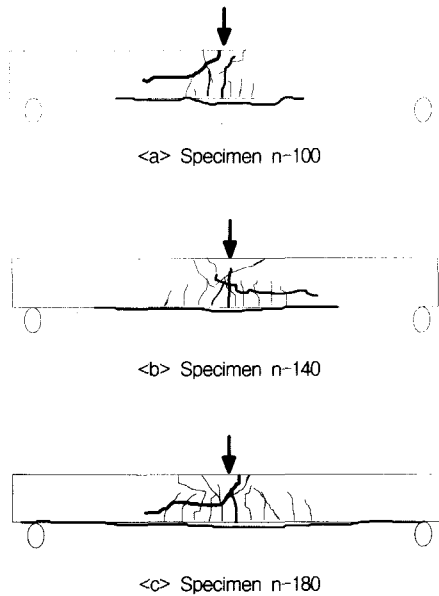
Crack propagation and failure mode of non-cracked specimens reinforced with fiber sheet
